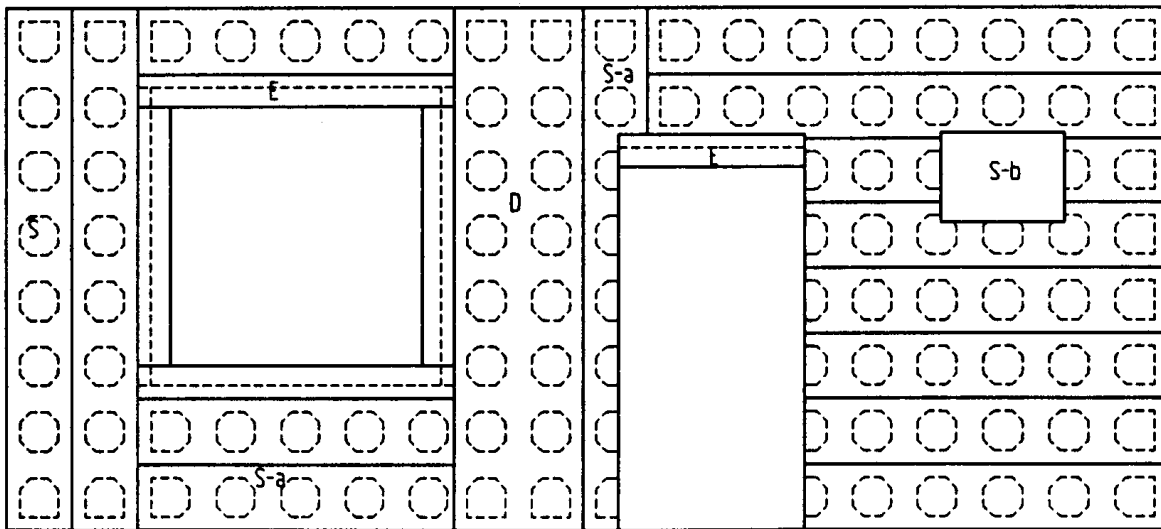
Example of a RASTRA® Wall Panel Layout Schedule
